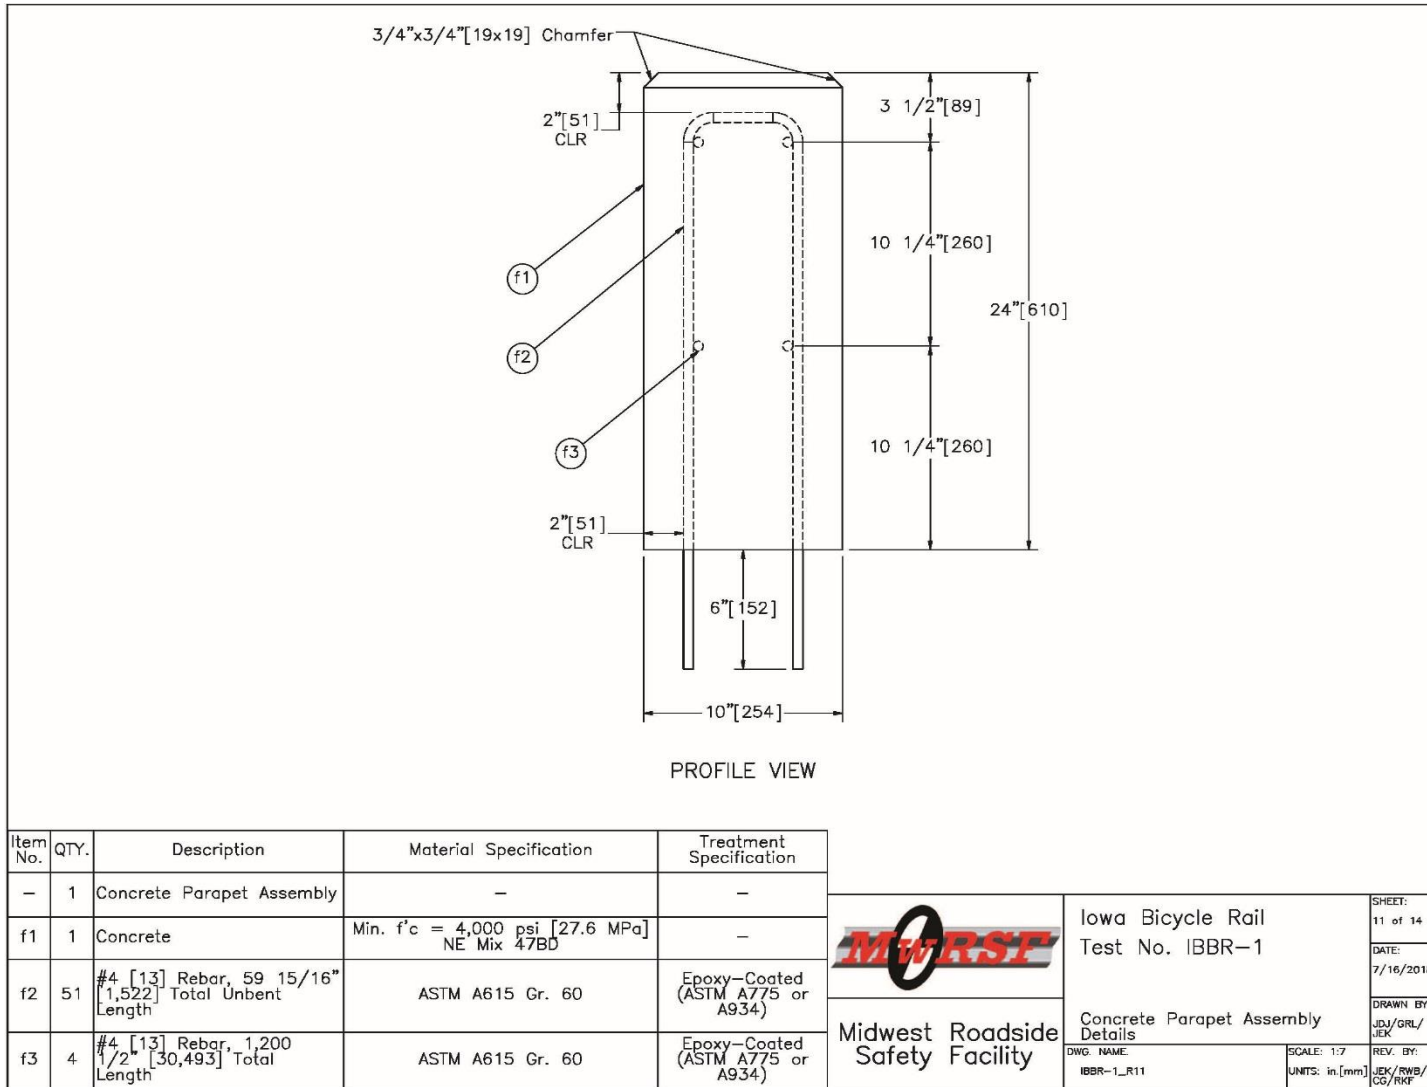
Iowa Bicycle Rail – Concrete Parapet Assembly Details
